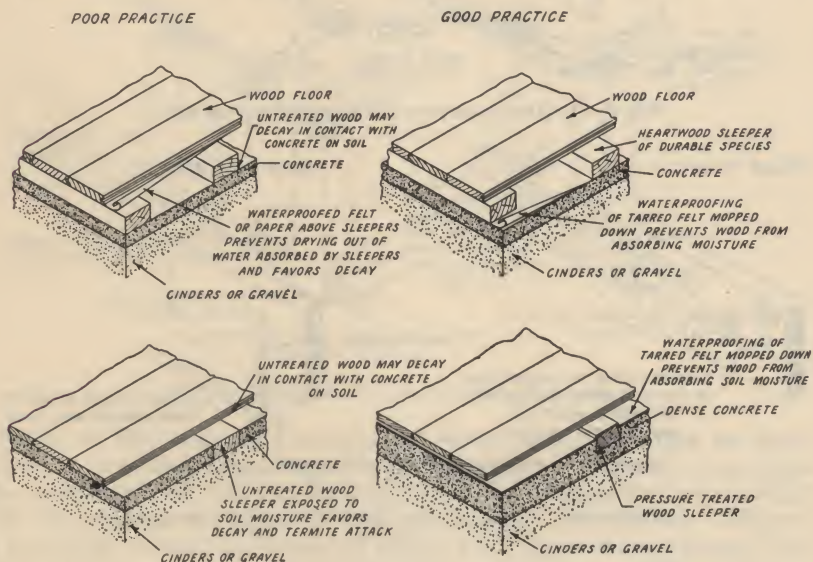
Good and poor practice with timber on concrete or masonry.
